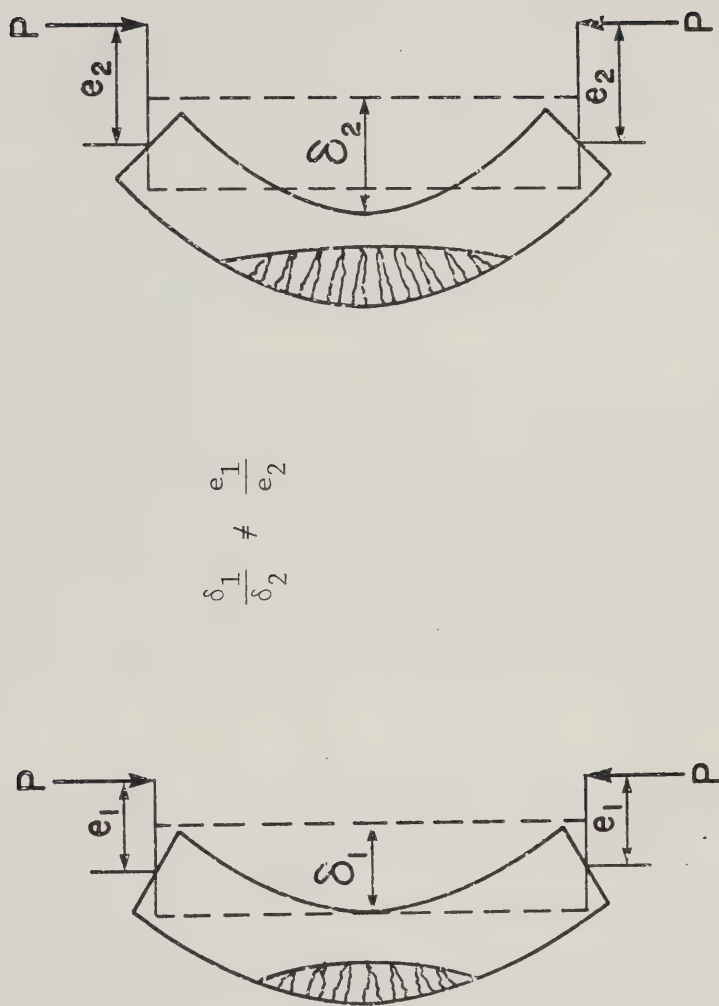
Deflections of Eccentrically Loaded Masonry Walls
